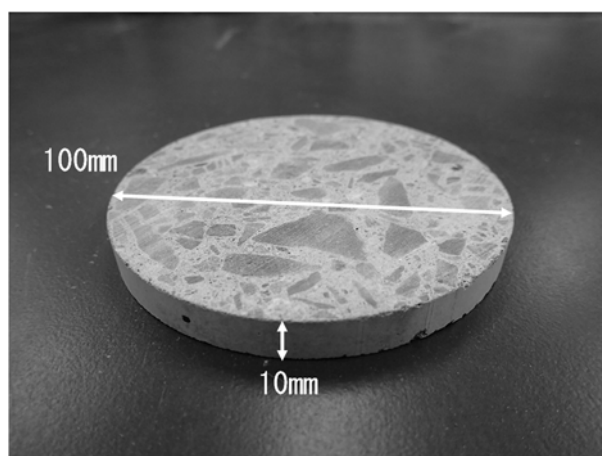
Disk specimen of concrete (コンクリートの円盤供試体)
